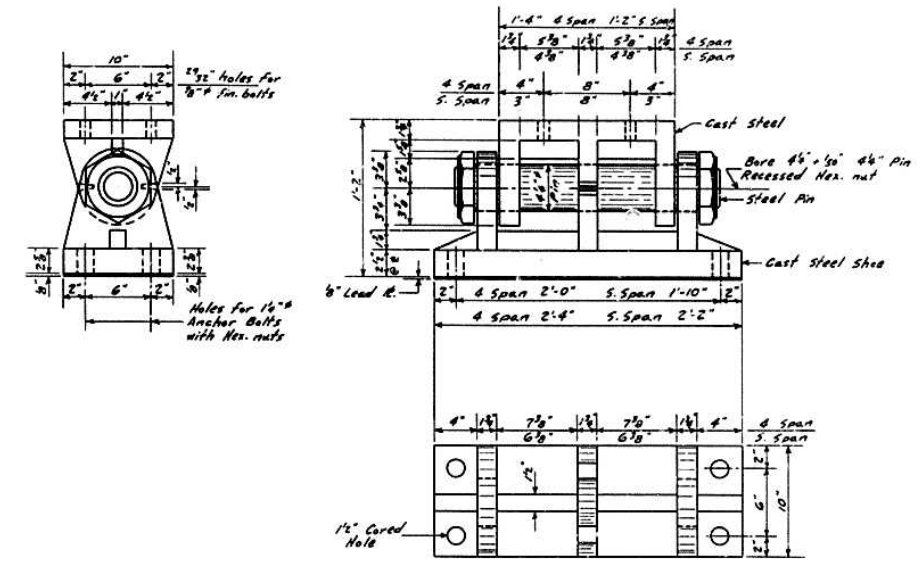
DETAIL OF EXPANSION BRG. - PIERS #8 & #12 - 4 SPAN UNIT
